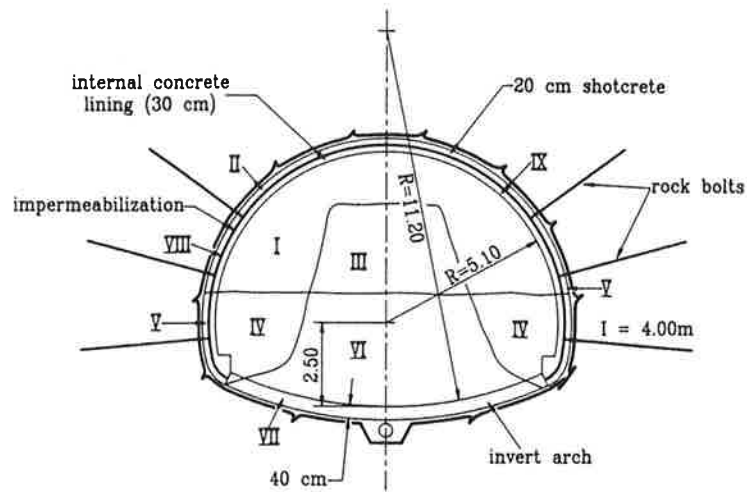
A sequential tunnel excavation from a highway tunnel close to Florence, excavated in clayey schists (adapted from Amberg and Cristini, 1986)
